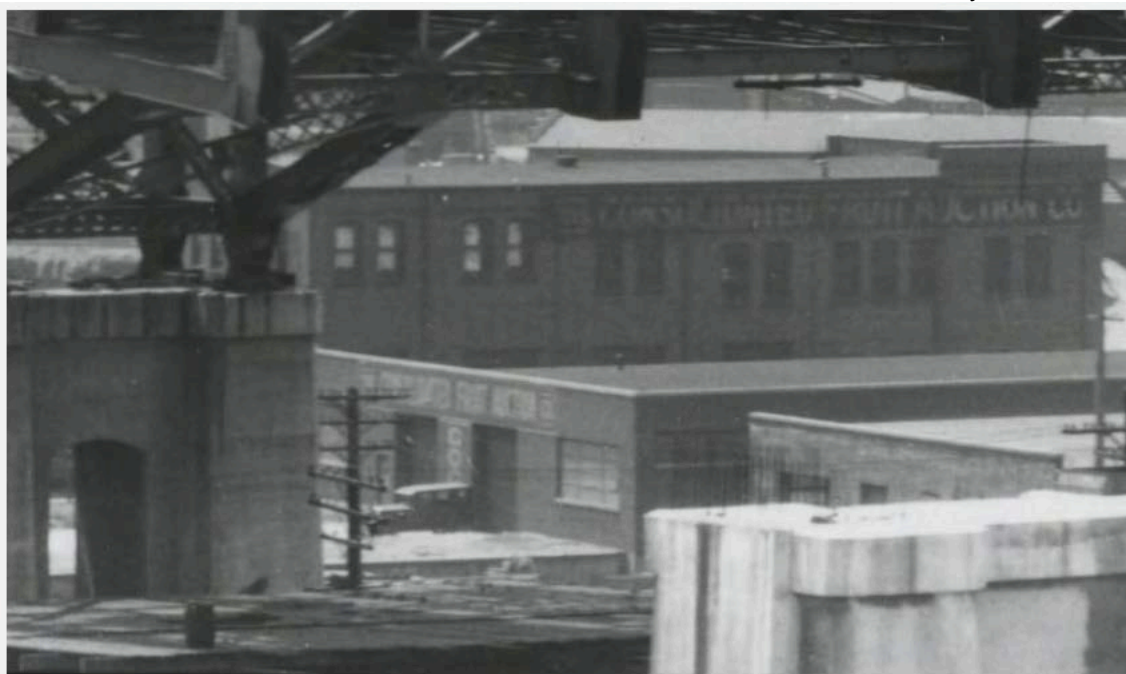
Lorain-Carnegie Bridge Construction, with bridge being built over Consolidated Fruit Auction Building, west elevation, 1931. *Source:* Online at Western Reserve Historical Society.
